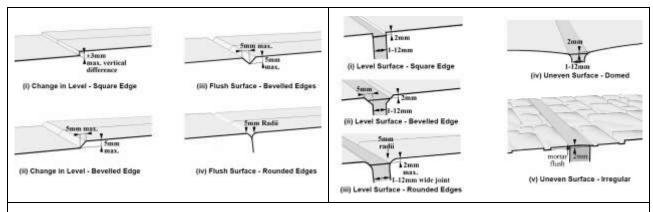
diagrams indicating the acceptable tolerances between pavement finishes
